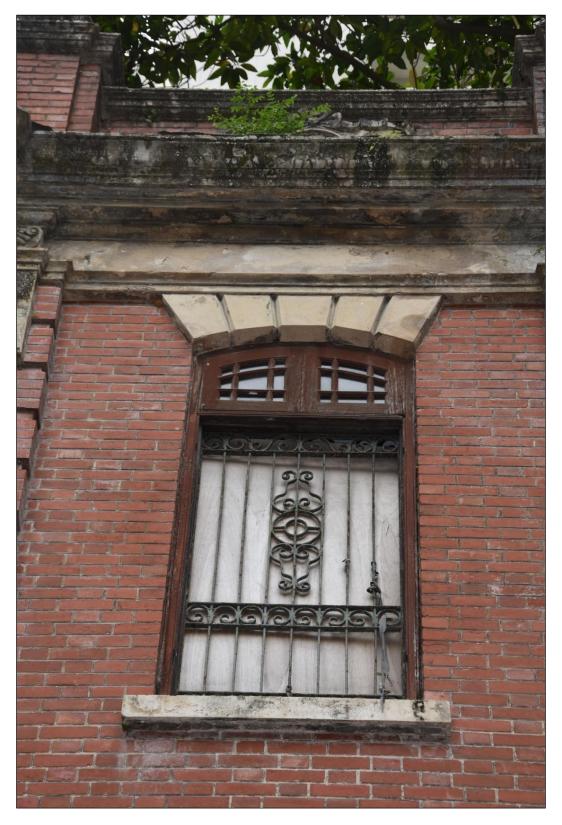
Main Building main facade, the window on first floor east side with the wrought iron window grille, (21st March, 2023)
